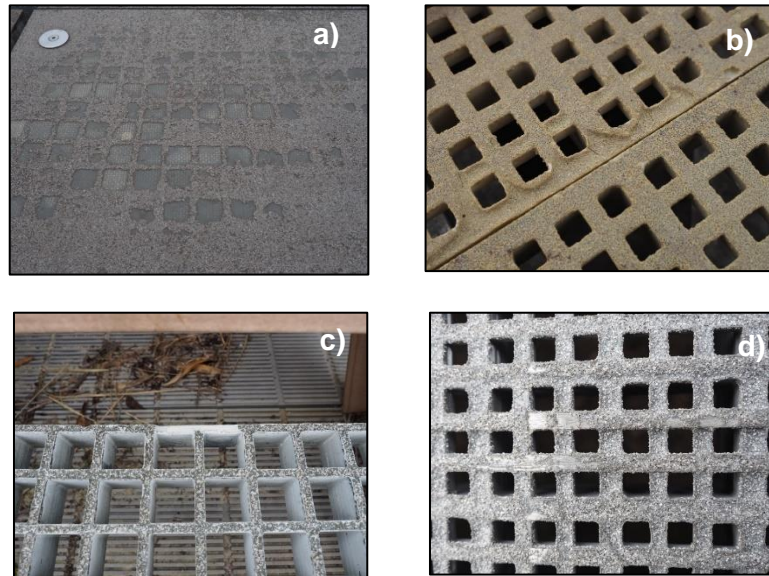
Material loss on the solid top section of the raised walkway at Kent Street Weir (a), the loading jetty at Aquarama Marina (b), an access staircase at Applecross boardwalk (c) and exposed fibres at Miller's Pool boardwalk (d).
